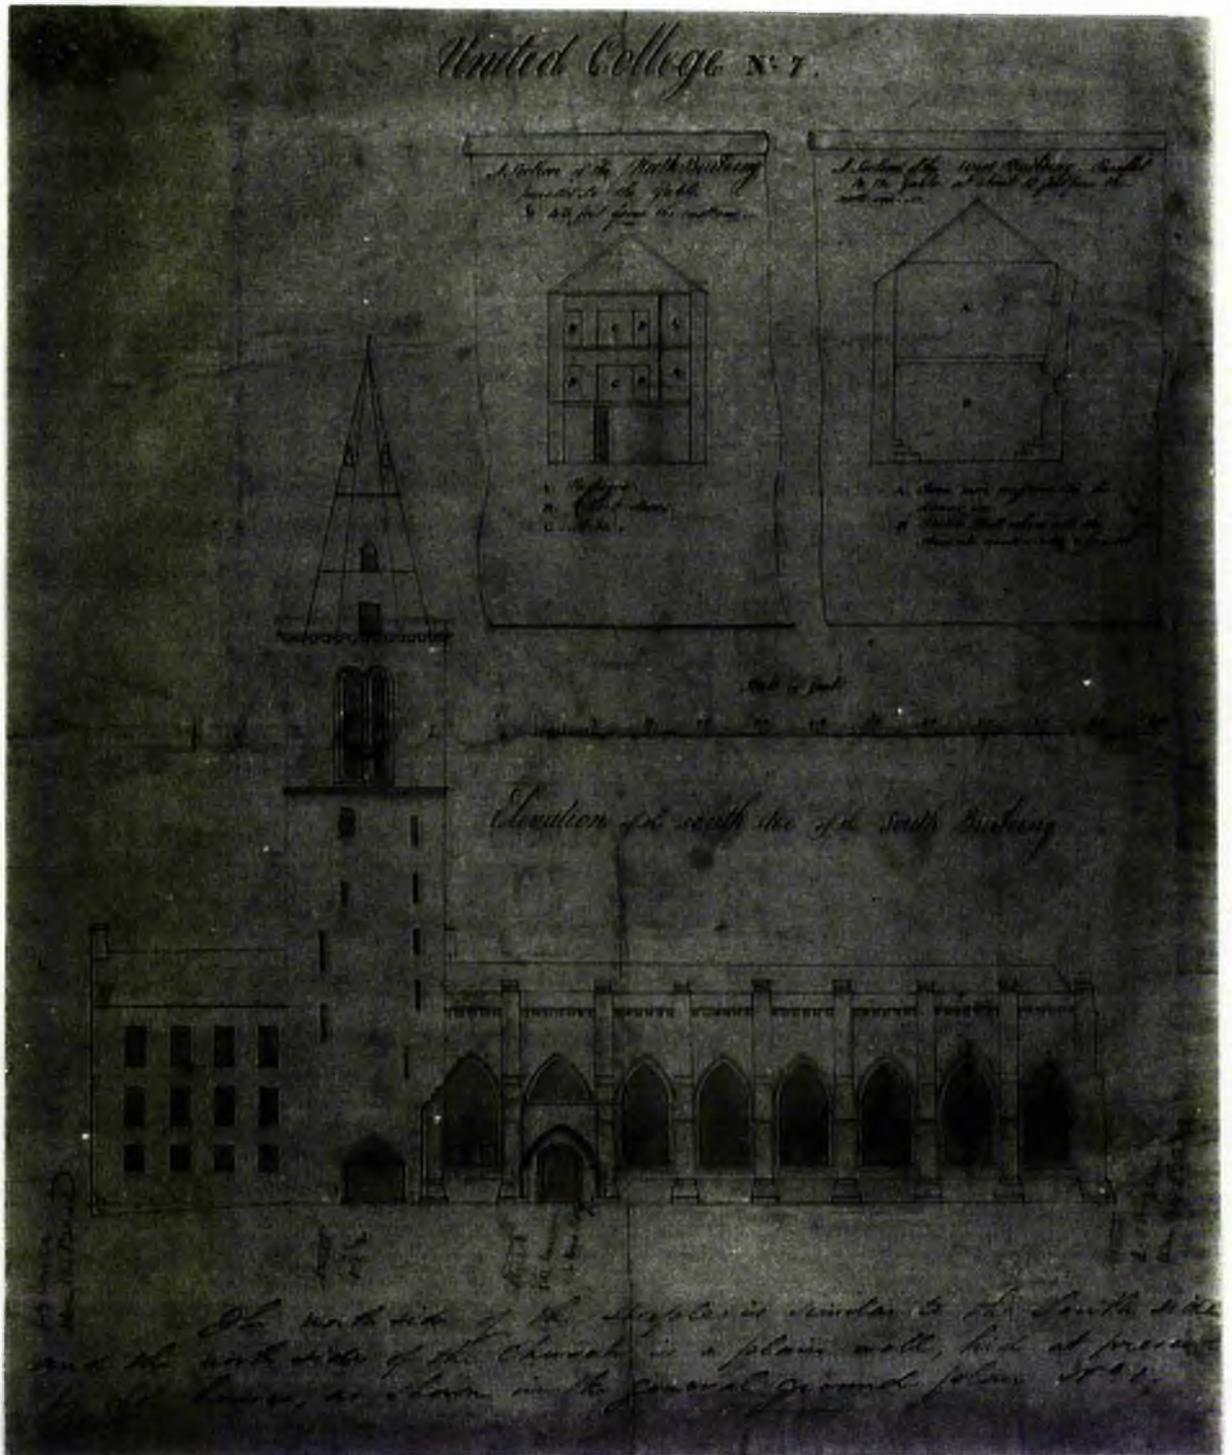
United College. Elevation of south side of south building. survey drawing No.7. R. Reid, probably drawn in 1825.
